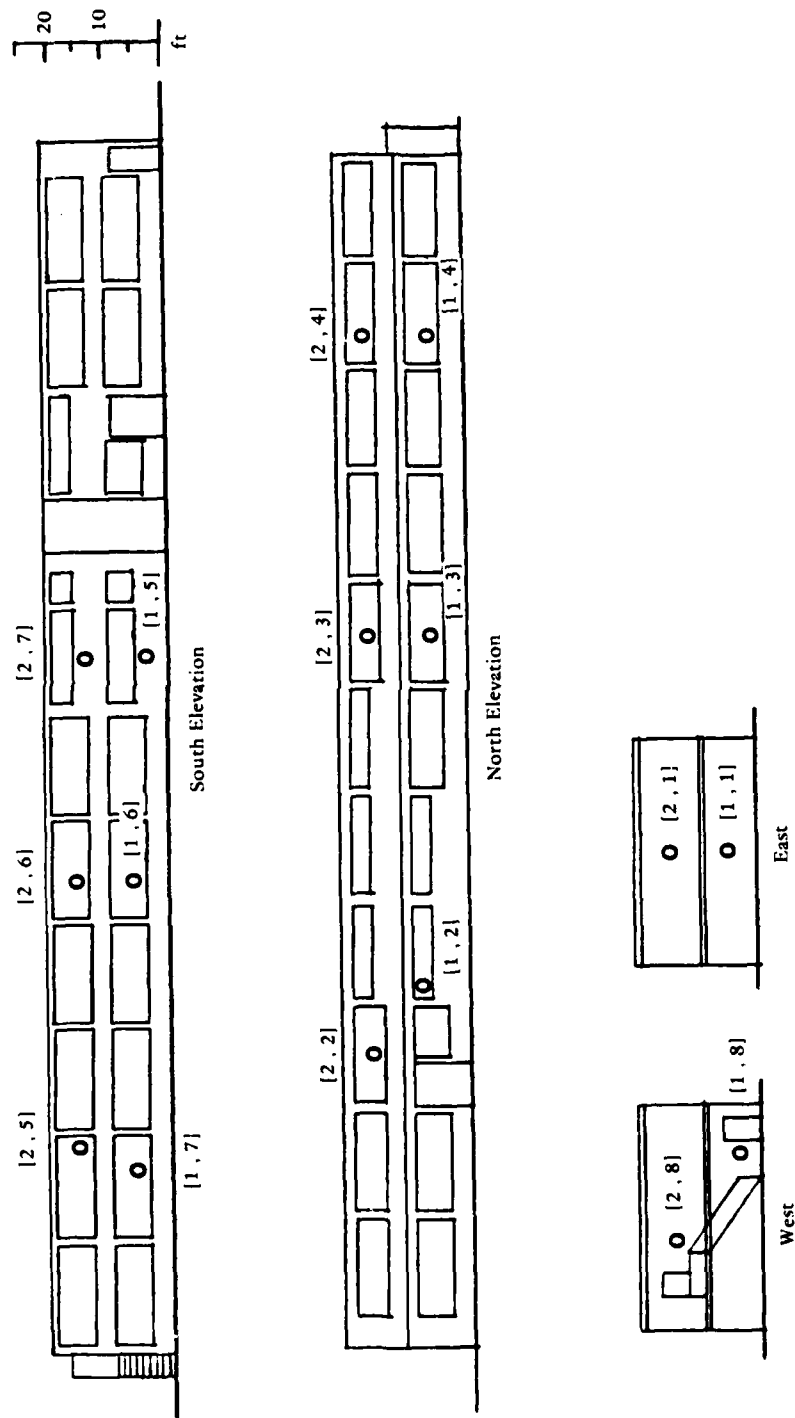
Elevation plan of Building No. 1 with the pressure taps locations shown.
